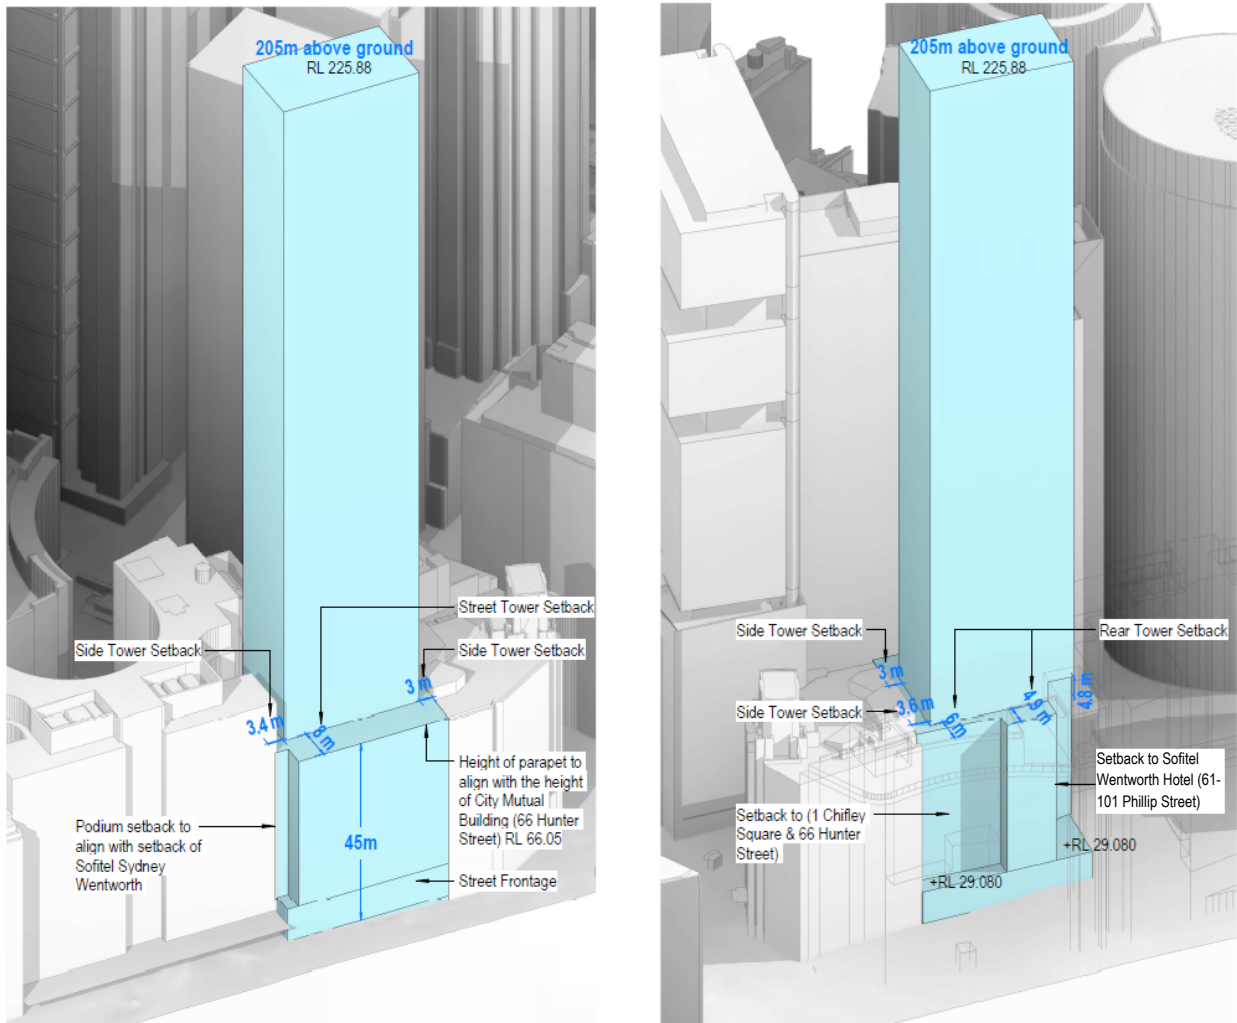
X Indicative Building Envelope Massing (Bligh Street frontage and rear)
